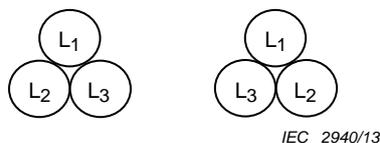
Recommended arrangement for installation of single core cables – trefoil configuration
